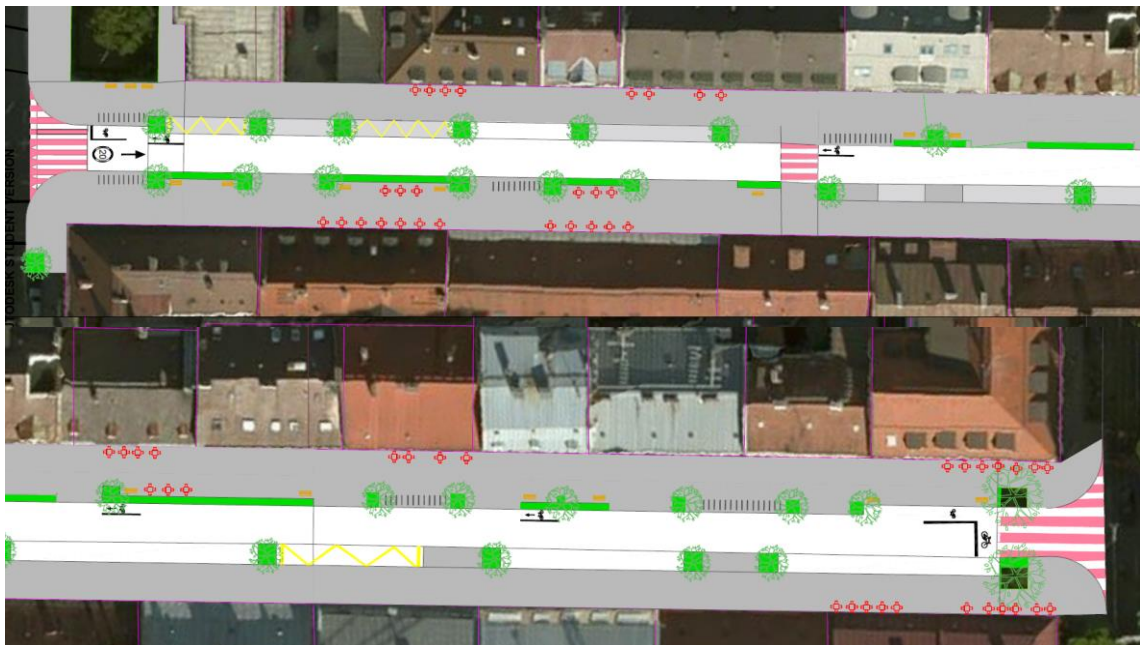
; Suggested final layout of Türkenstrasse. Source: own preparation.
